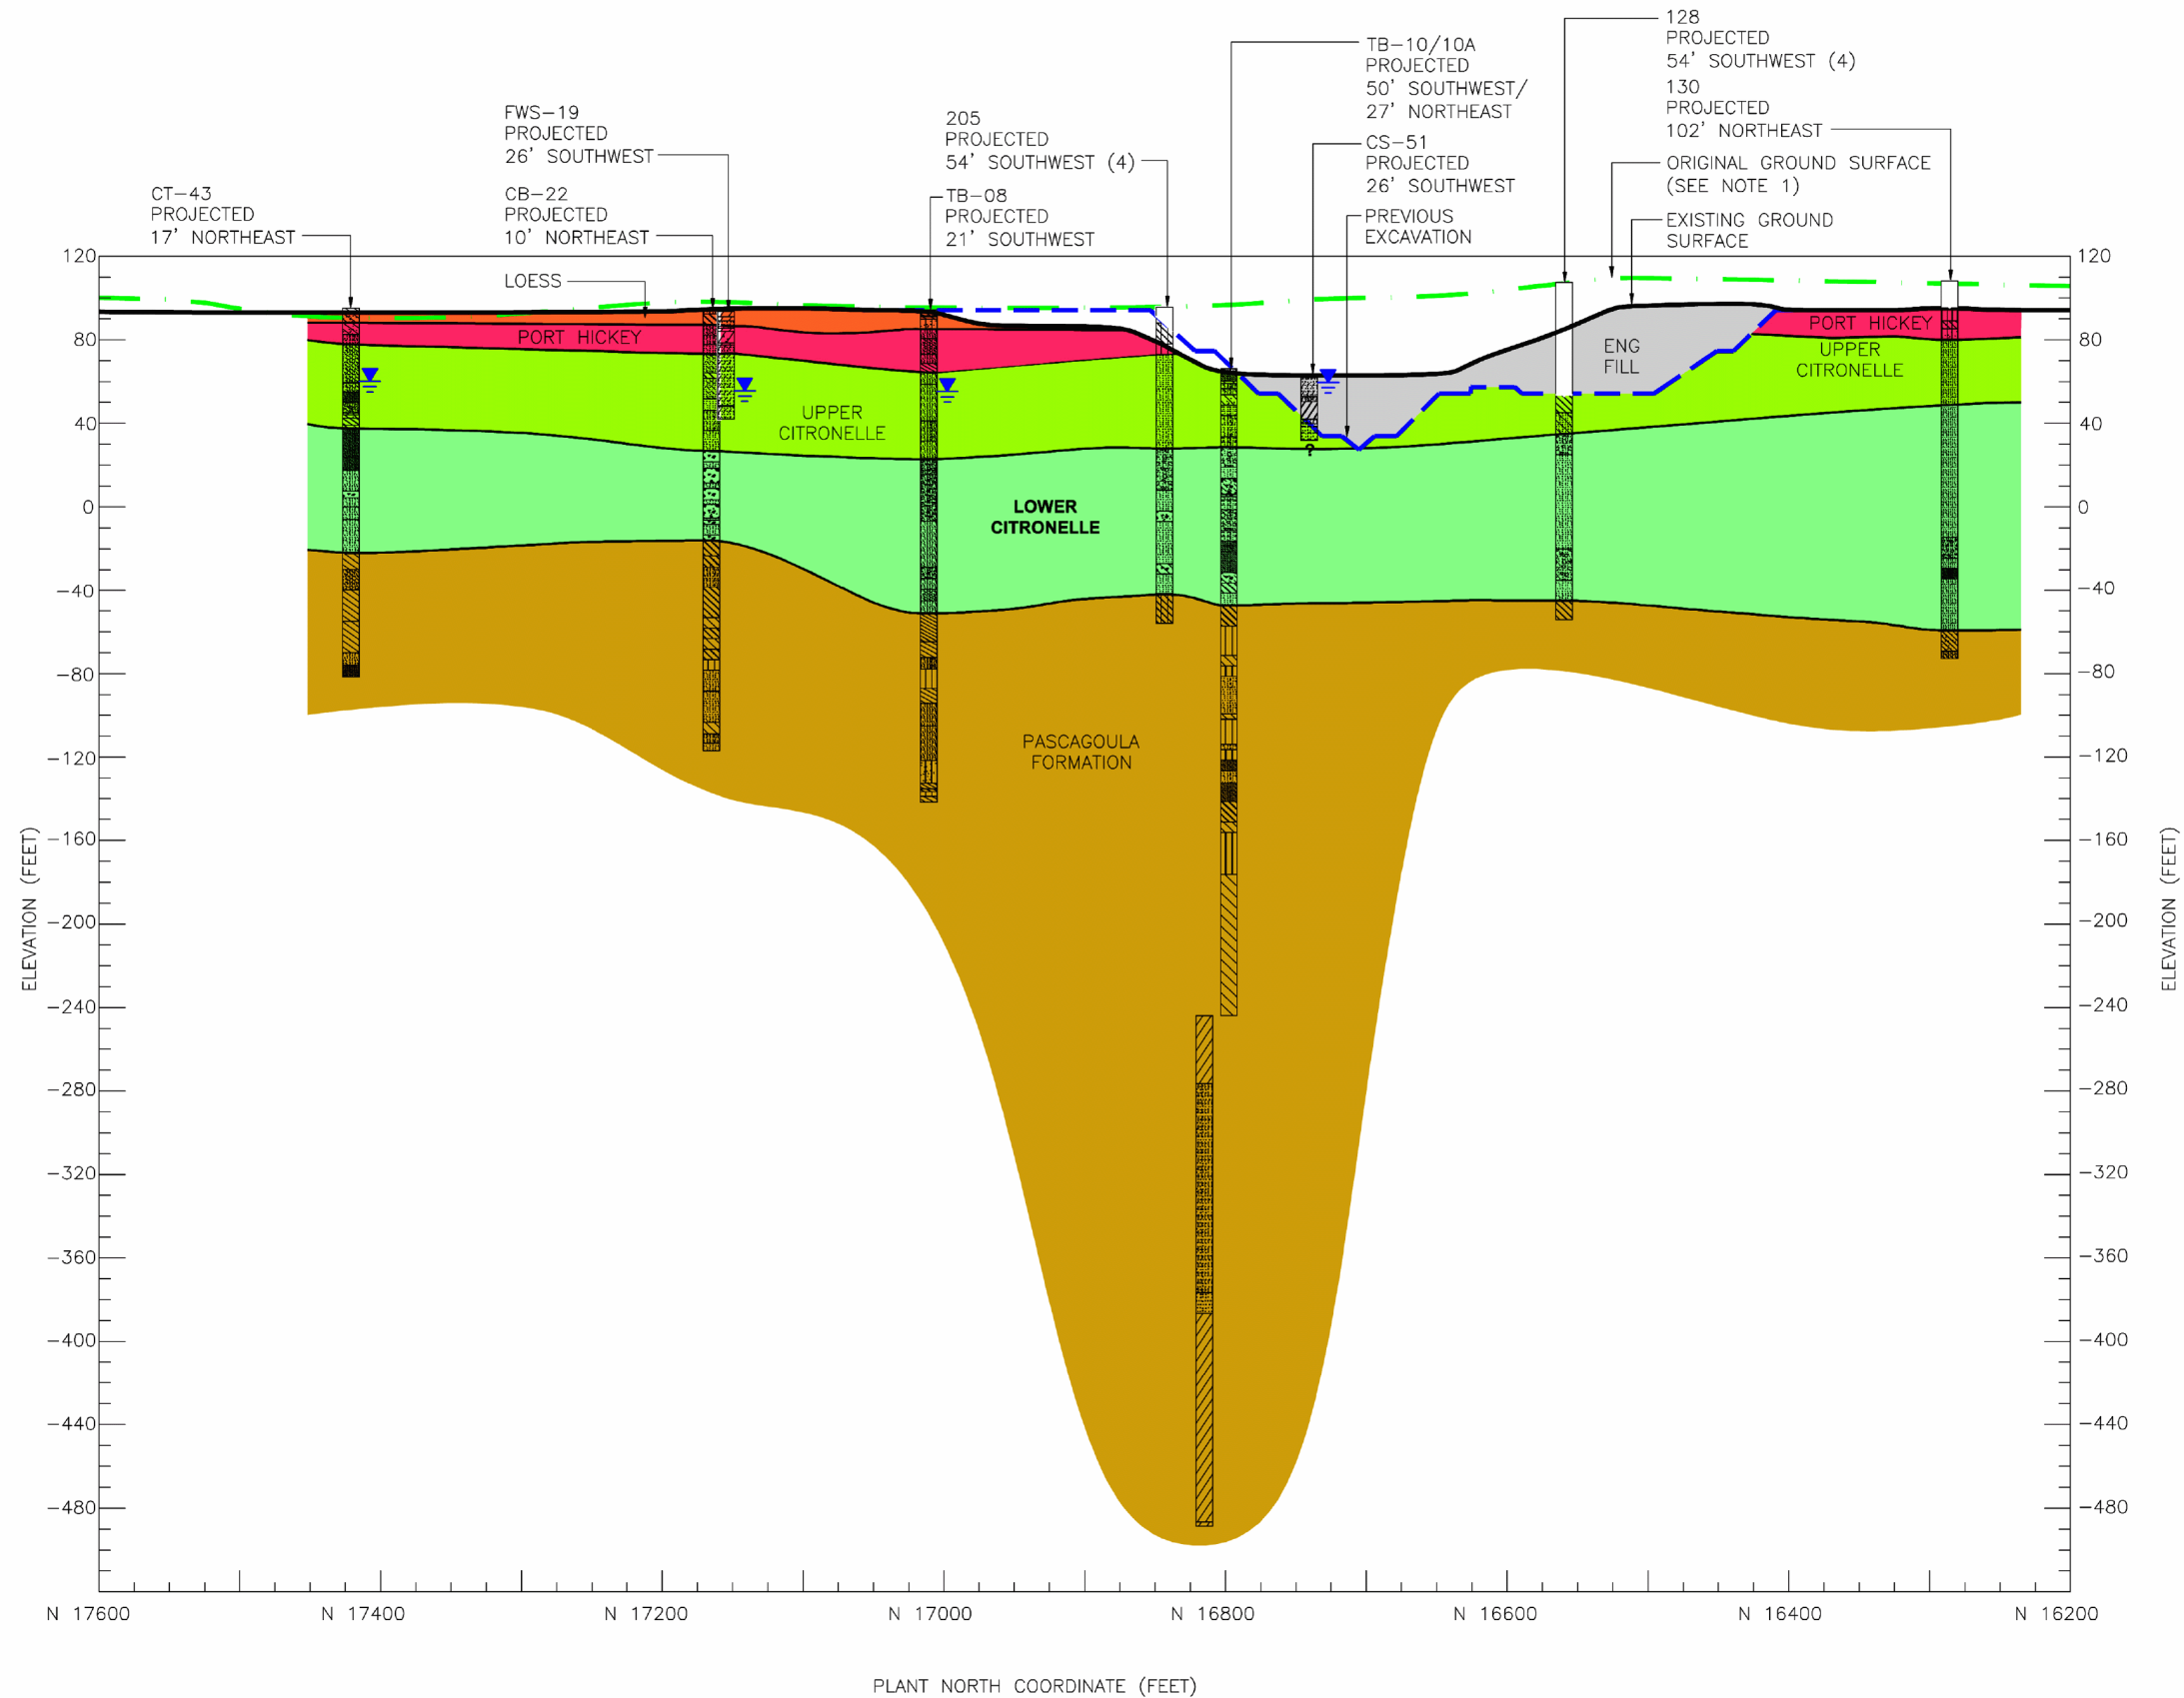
Northwest-Southeast Cross Section through Unit 3 Site Location
